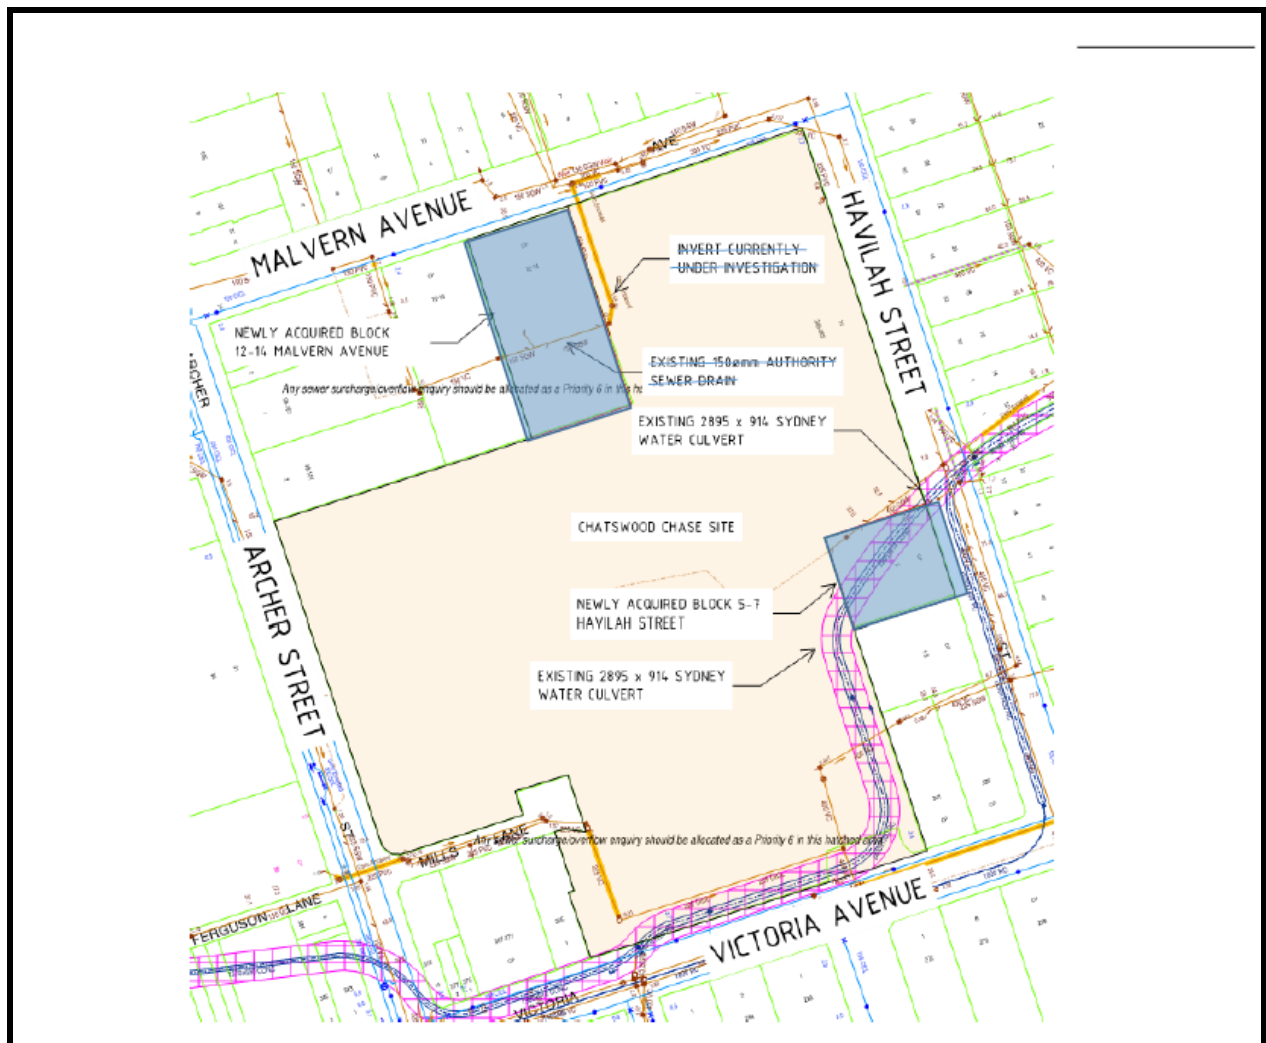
Existing main drainage plan (extract from Flooding Report dated 14 September 2018 and prepared by CJ Arms & Associates)
